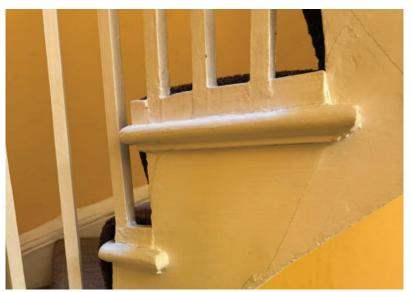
(Above) No.70. Non-original firring piece over the existing tread.
